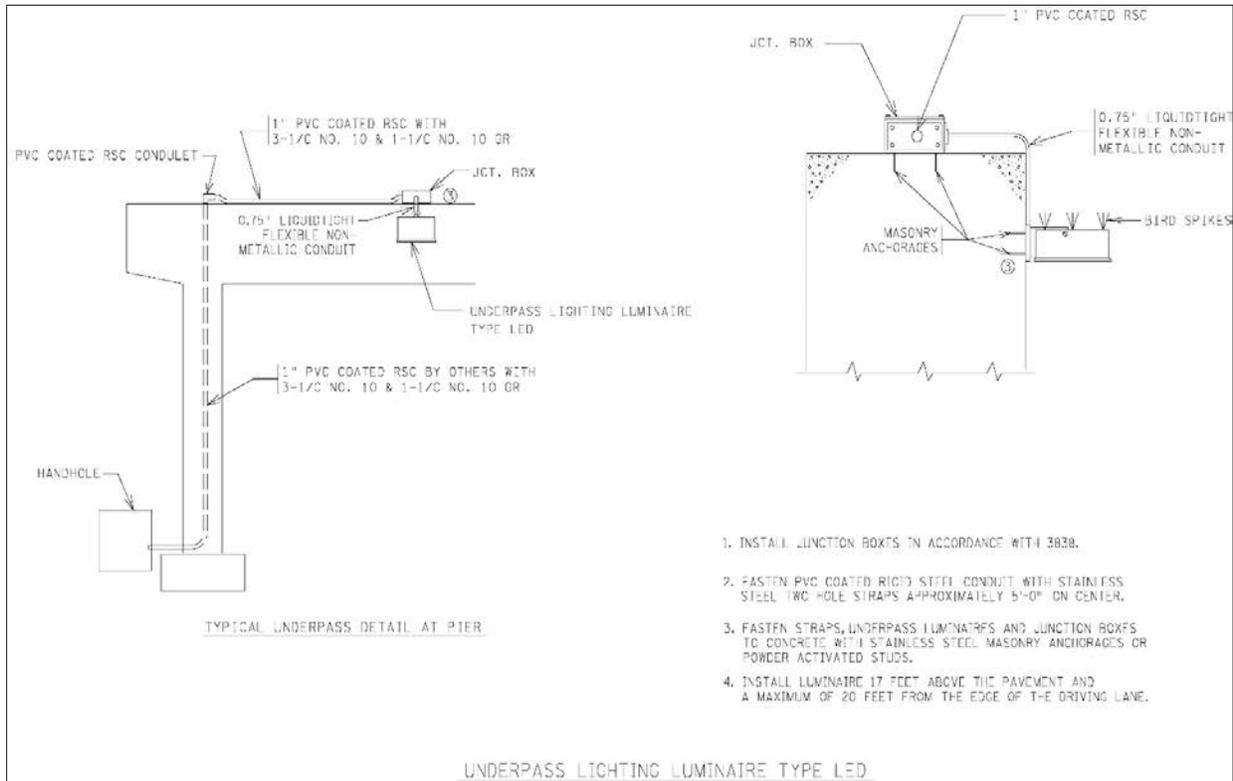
Example Lighting Detail Sheet Showing Underpass Luminaires
